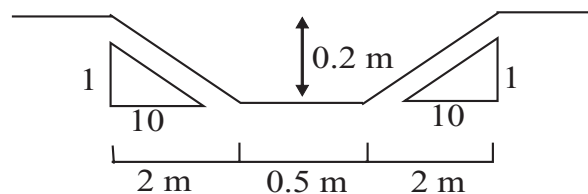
Cross section of an at-grade driveway crossing a swale to be provided
